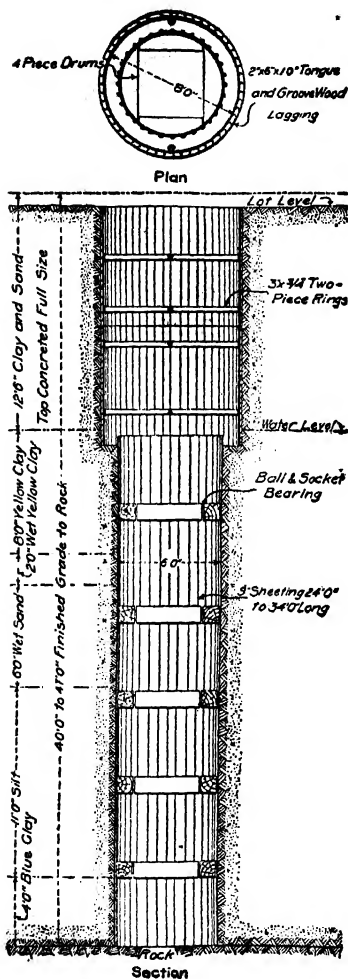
Open well for pier under the Railway Exchange Building, St. Louis.
